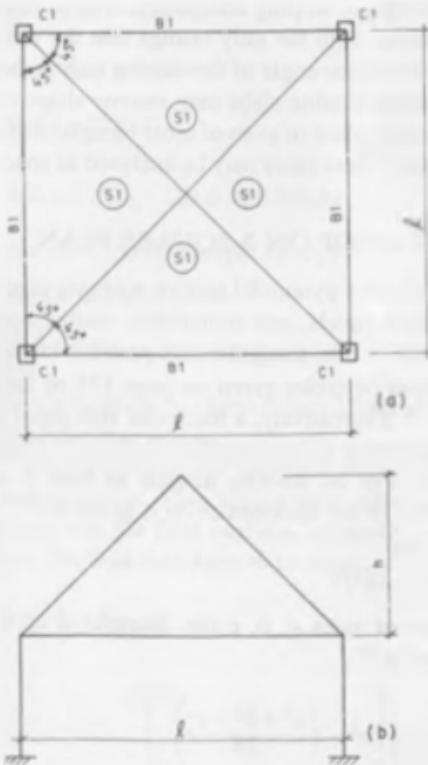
Pyramidal roof on square plant. (a) Plan; (b) Elevation.
